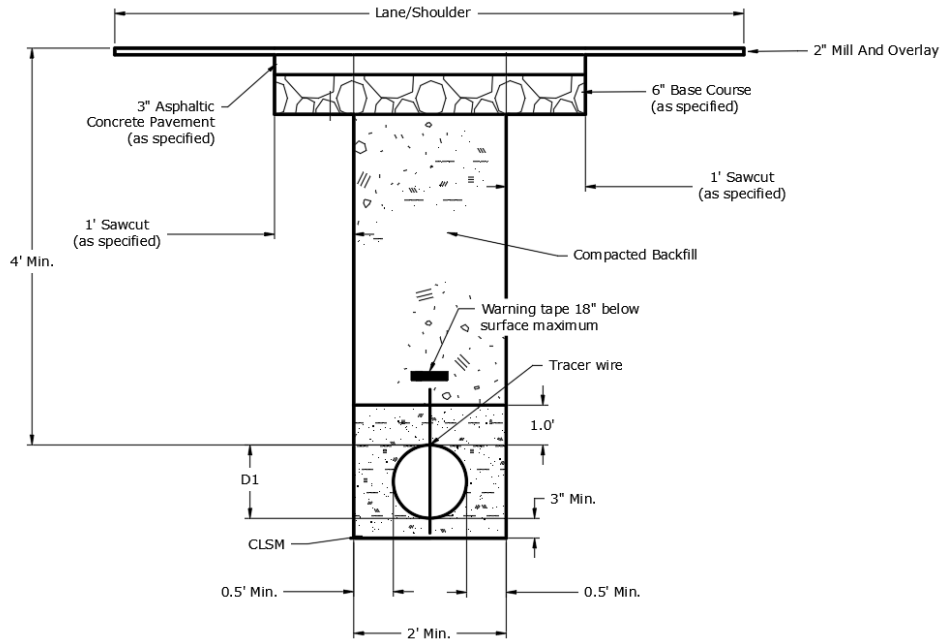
Phase 2 Pipe Trench and Bedding Configuration for Paved Road Installation
